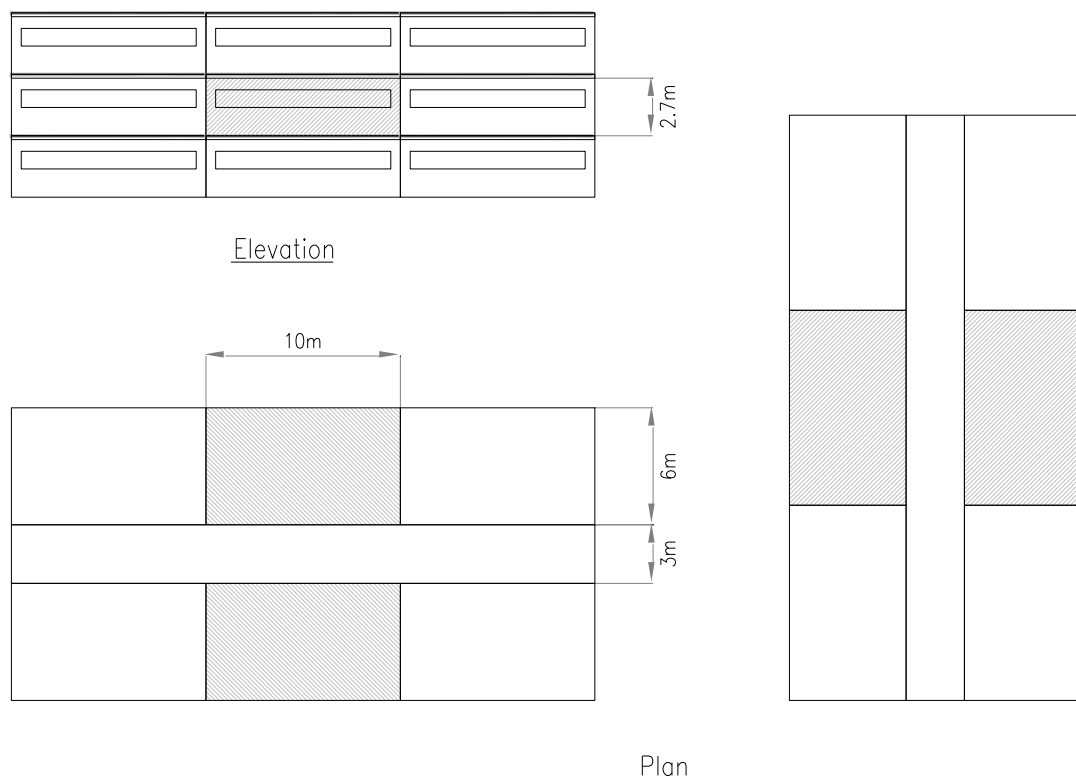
2 Plan and elevation of office blocks with test rooms highlighted
